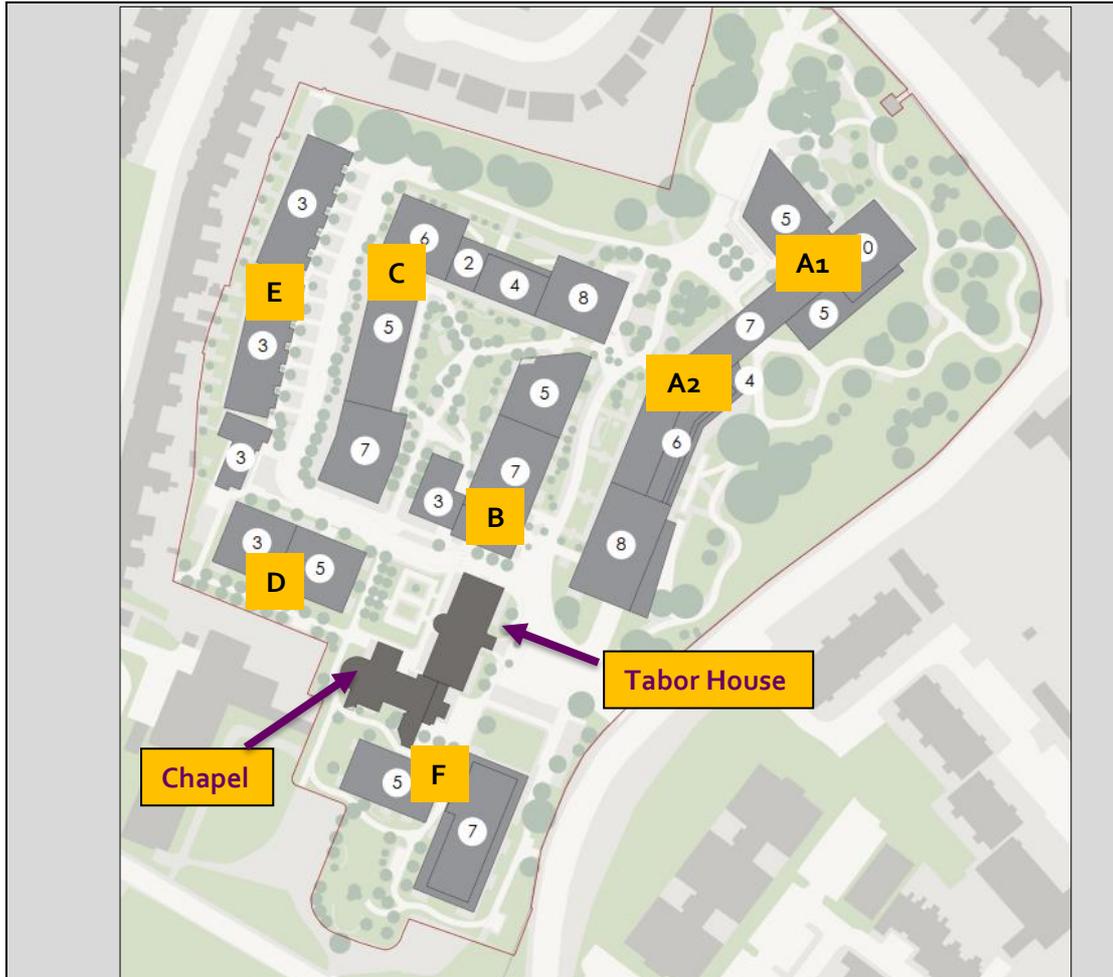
Site Plan Demonstrating Height of the Proposed Blocks
